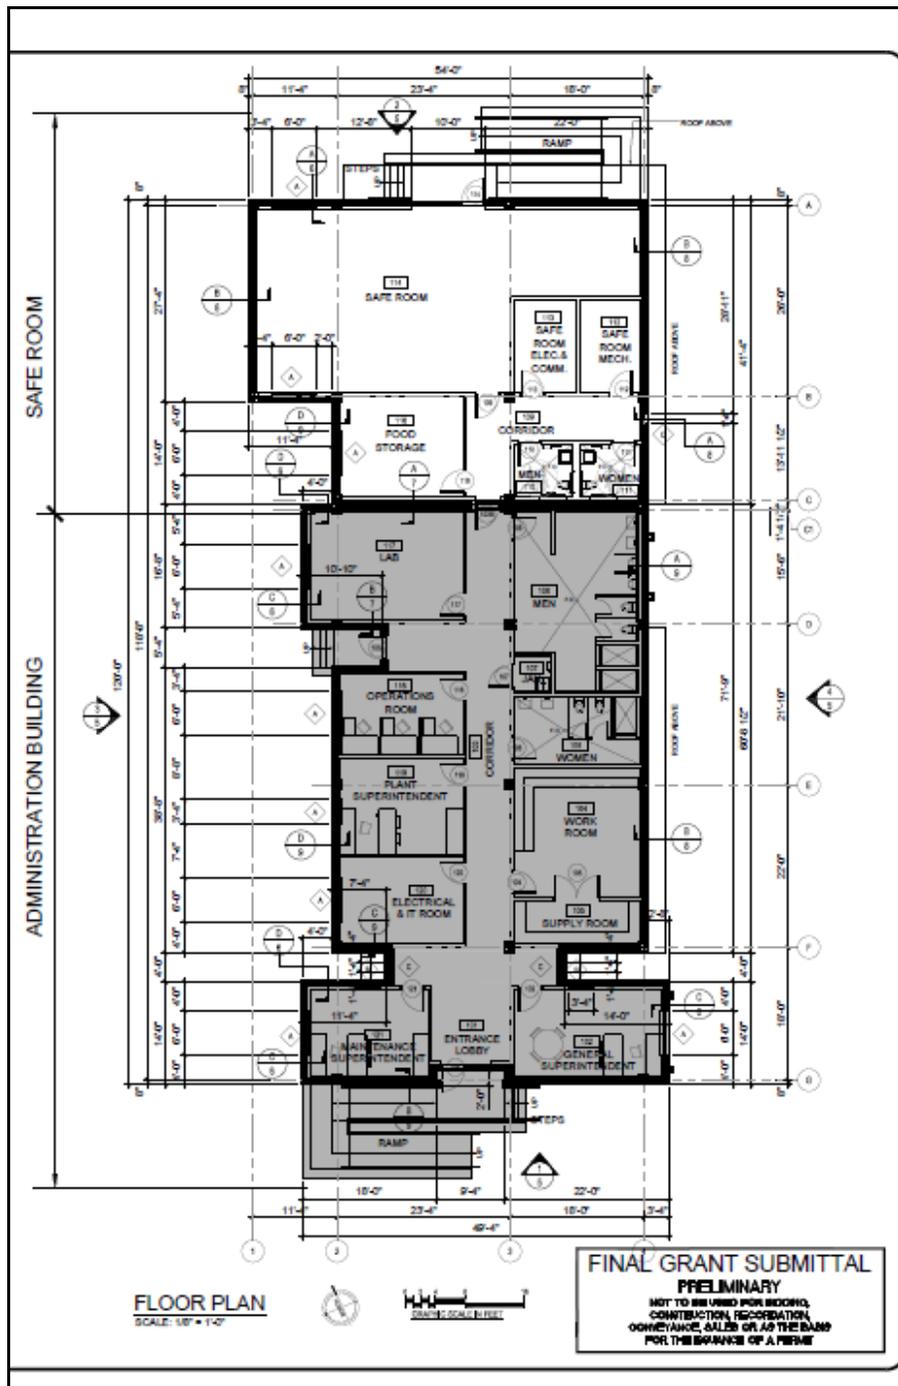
Safe Room and Administration Building Floor Plans, dated May 2016.
